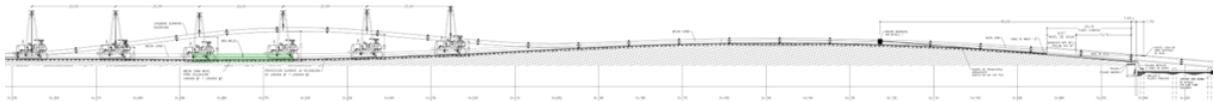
Onshore Sideboom Layout for Product Pipe Push Installation
